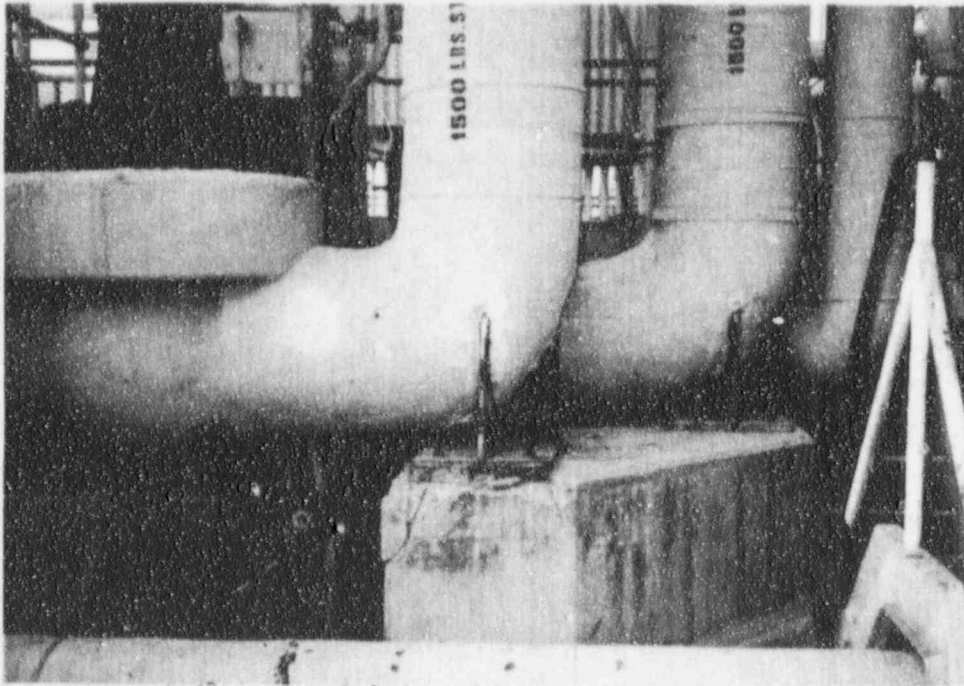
Damage Pipe Support Concrete Block at Elbow
